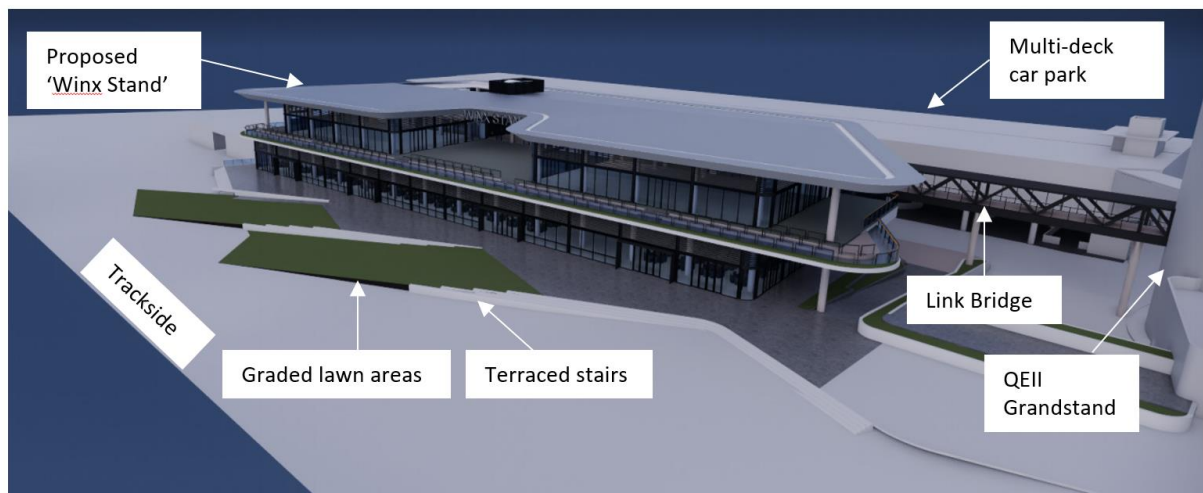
| Photomontage of the Winx Stand – trackside elevation (Source: Applicant's RtS)
